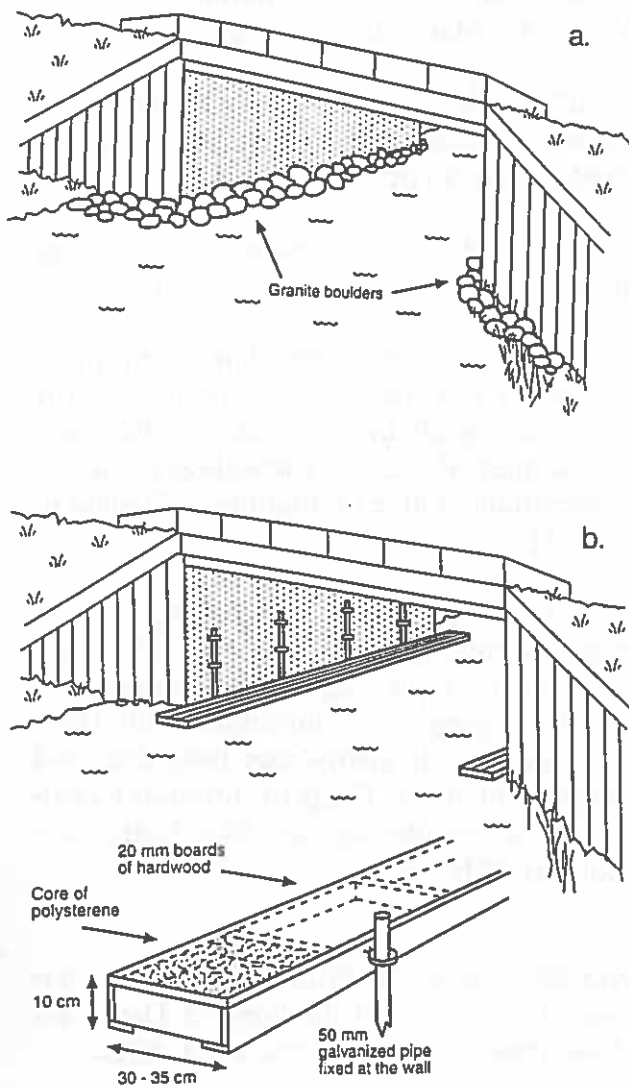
Fauna passages made of granite boulders (a) and floating pontoon bridges of hardwood with a core of polystyrene (b) recommended for existing road bridges.
